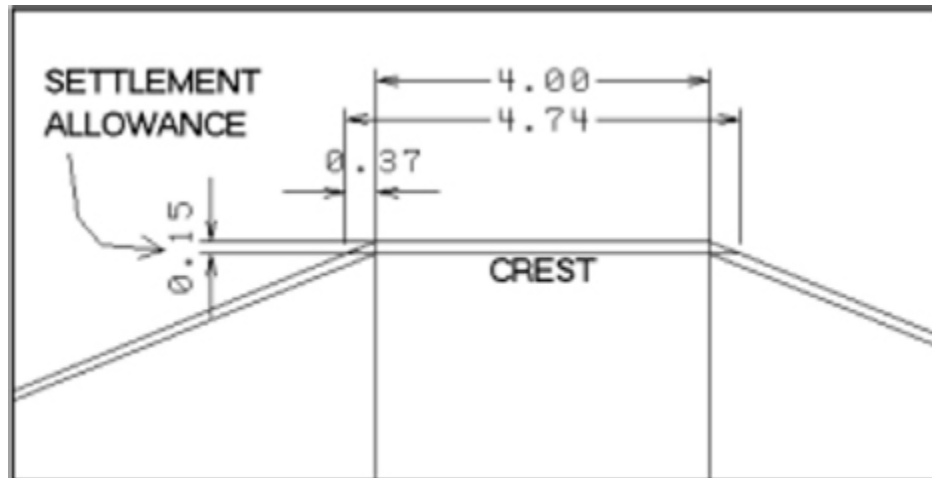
Upper section of an 8 metre wall showing the settlement allowance dimensions.
